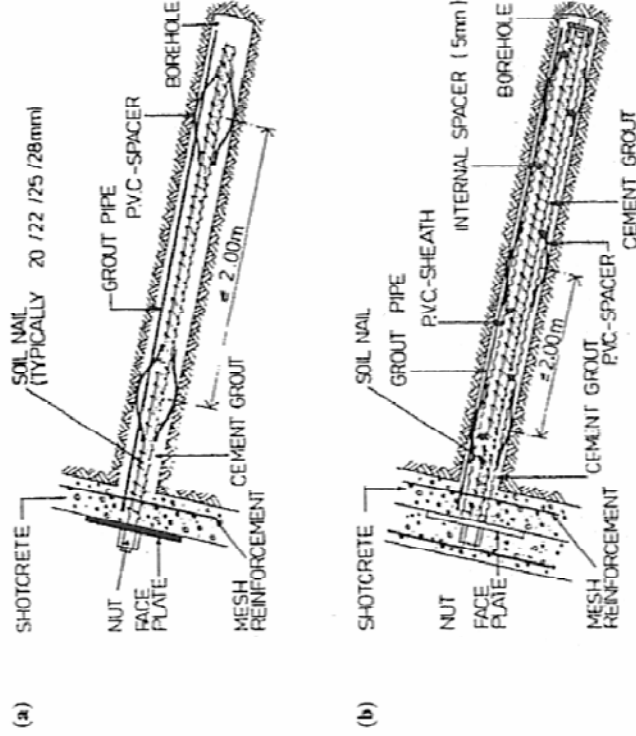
Examples of good practice for drilled and grouted nail installation: (a) for temporary applications; and (b) for permanent applications. (Based on (formerly) West German experience, and reproduced with permission of Bauer, A.G.)
